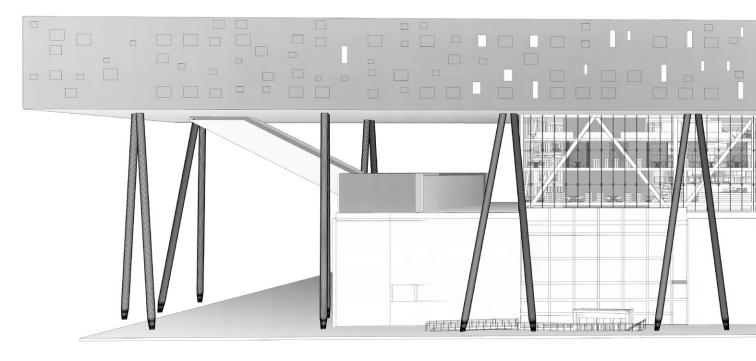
Perspective elevation of the design proposal from McCaul Street.
